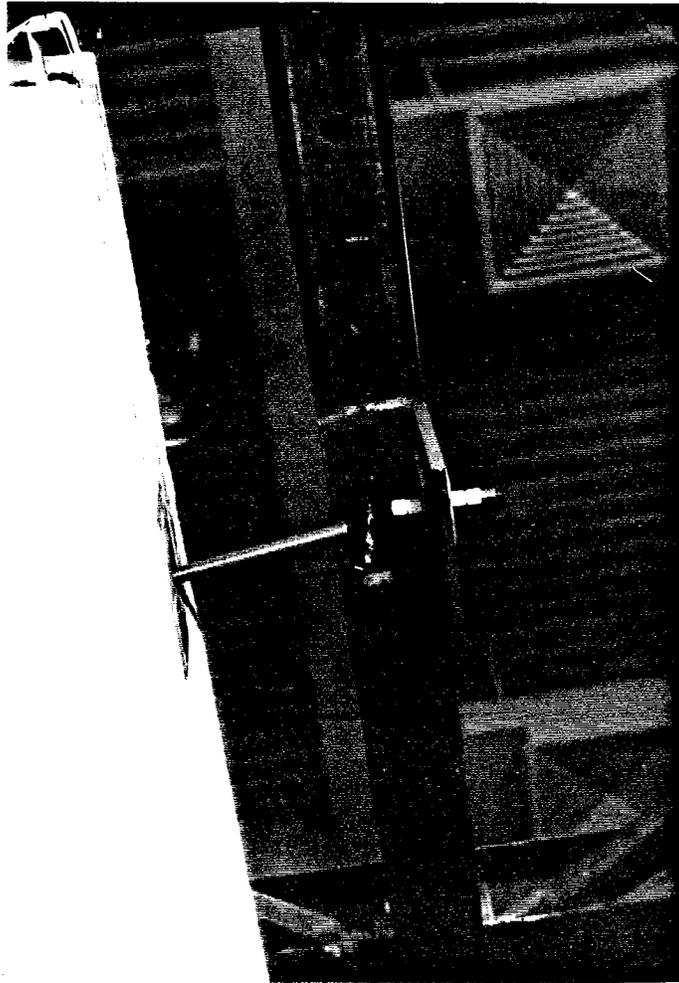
Typical Failure of Threaded-Rod Connection at Top
